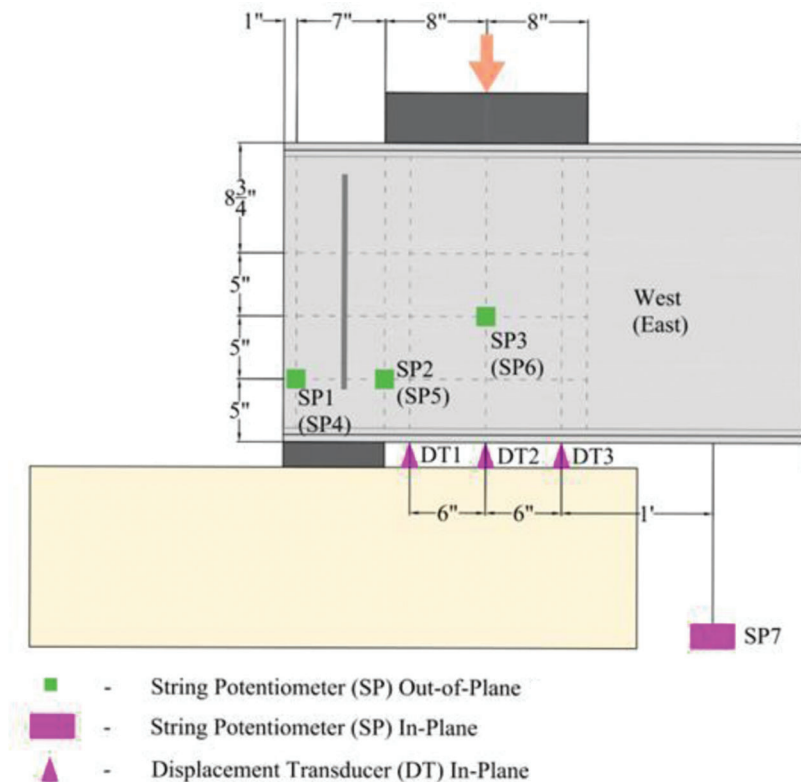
Displacement sensor layout (side elevation): Specimen 1.
